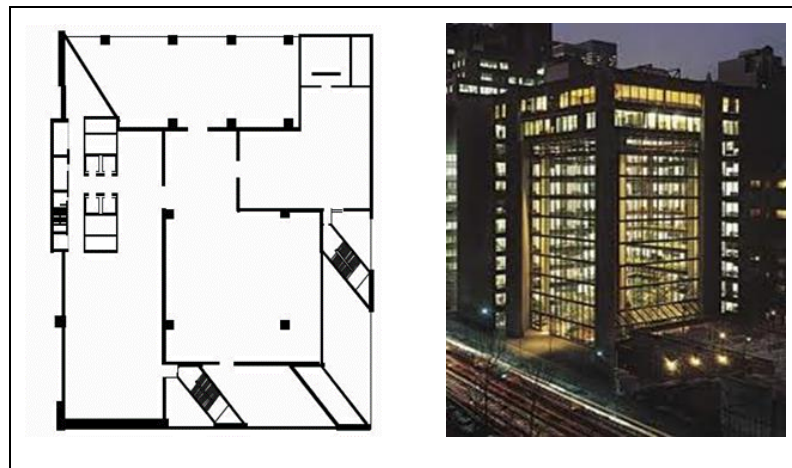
Plan (left) and outside view (right) of the Ford Foundation in New York City, 1968.
